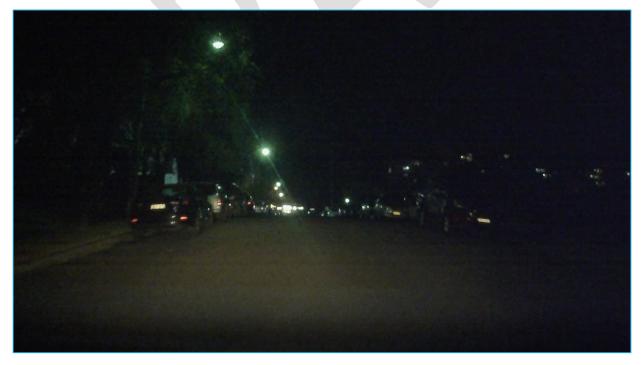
Trees obstruct lighting of street on Ashley Street
